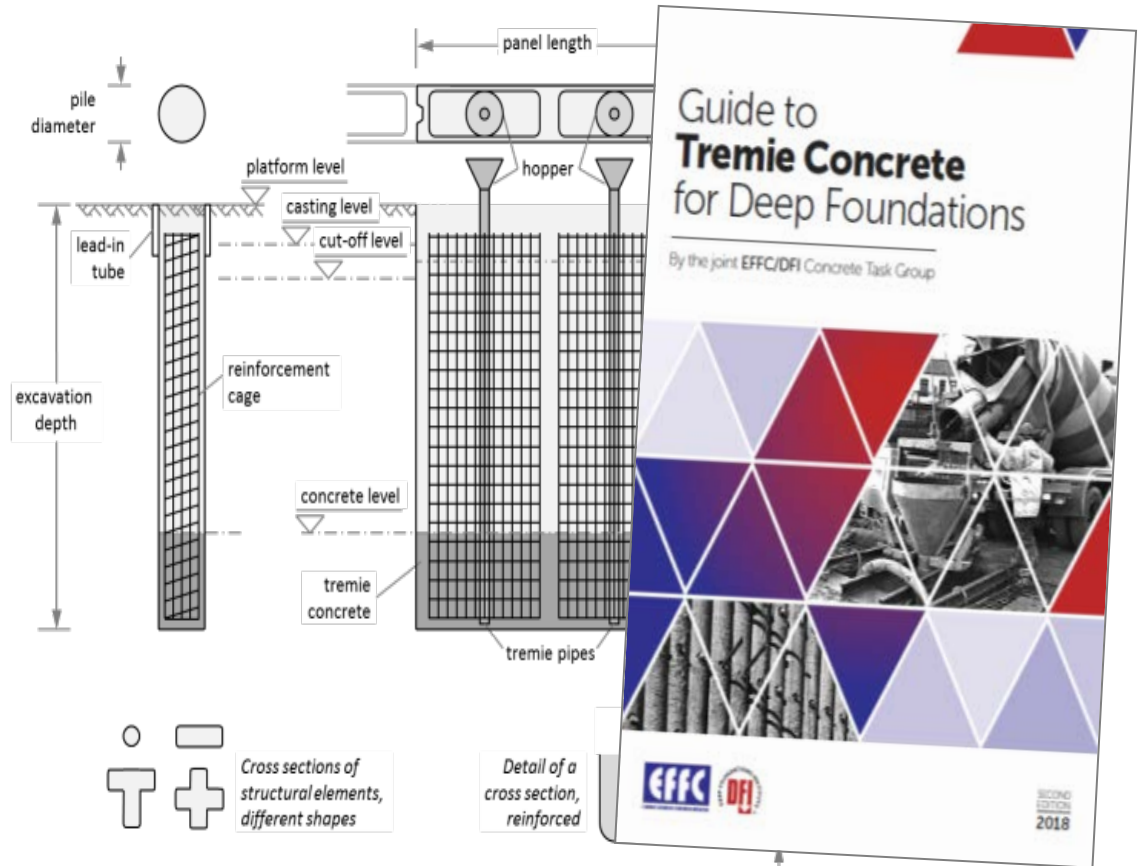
EXAMPLES OF DEEP FOUNDATIONS
